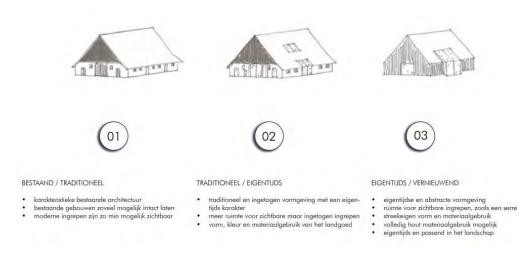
architectural expression of the buildings. From: beeldkwaliteitsplan Singraven.
